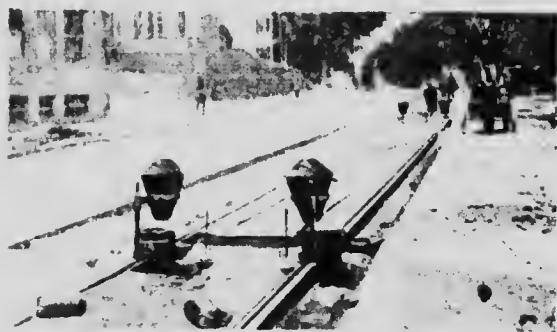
,761.—Preheating the Moulds Before Welding.
